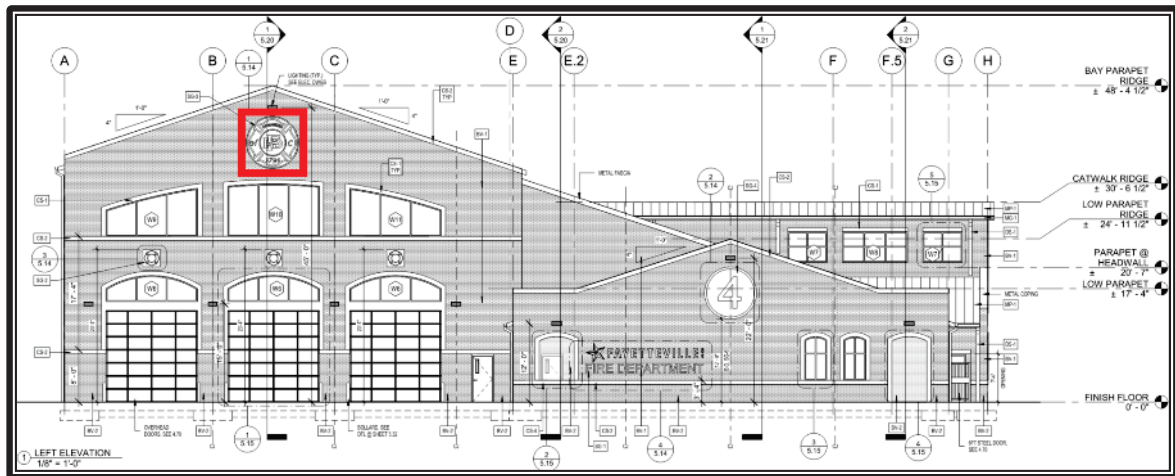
West exterior wall elevation showing the approximate location of Test Area 1 (outlined) (cropped plan courtesy of SCNA).
